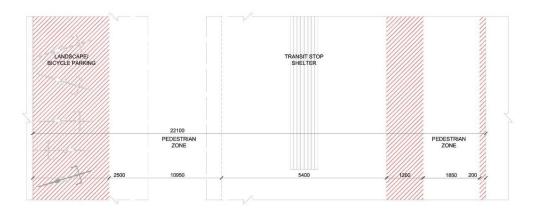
Street width and buffer spaces (in mm) for Gateway 7 in the area surrounding Darmstadt Hauptbahnhof
